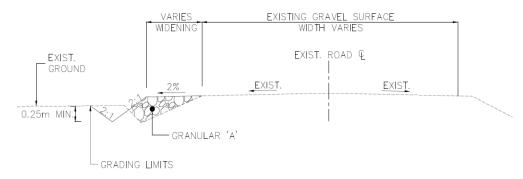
Typical Temporary Road Widening (N.T.S.)
